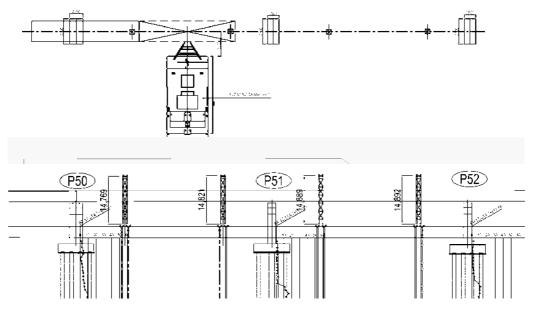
RNo.3 Erection Girder Installation
